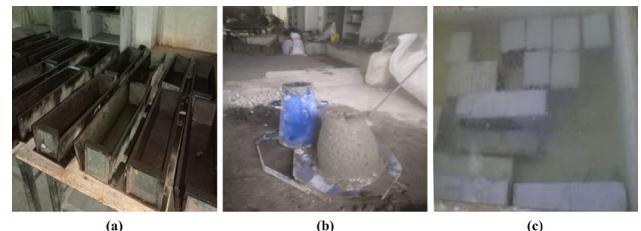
(a) Casting of the beam in mold, (b) Workability test, and (c) Curing process of the concrete beam.
